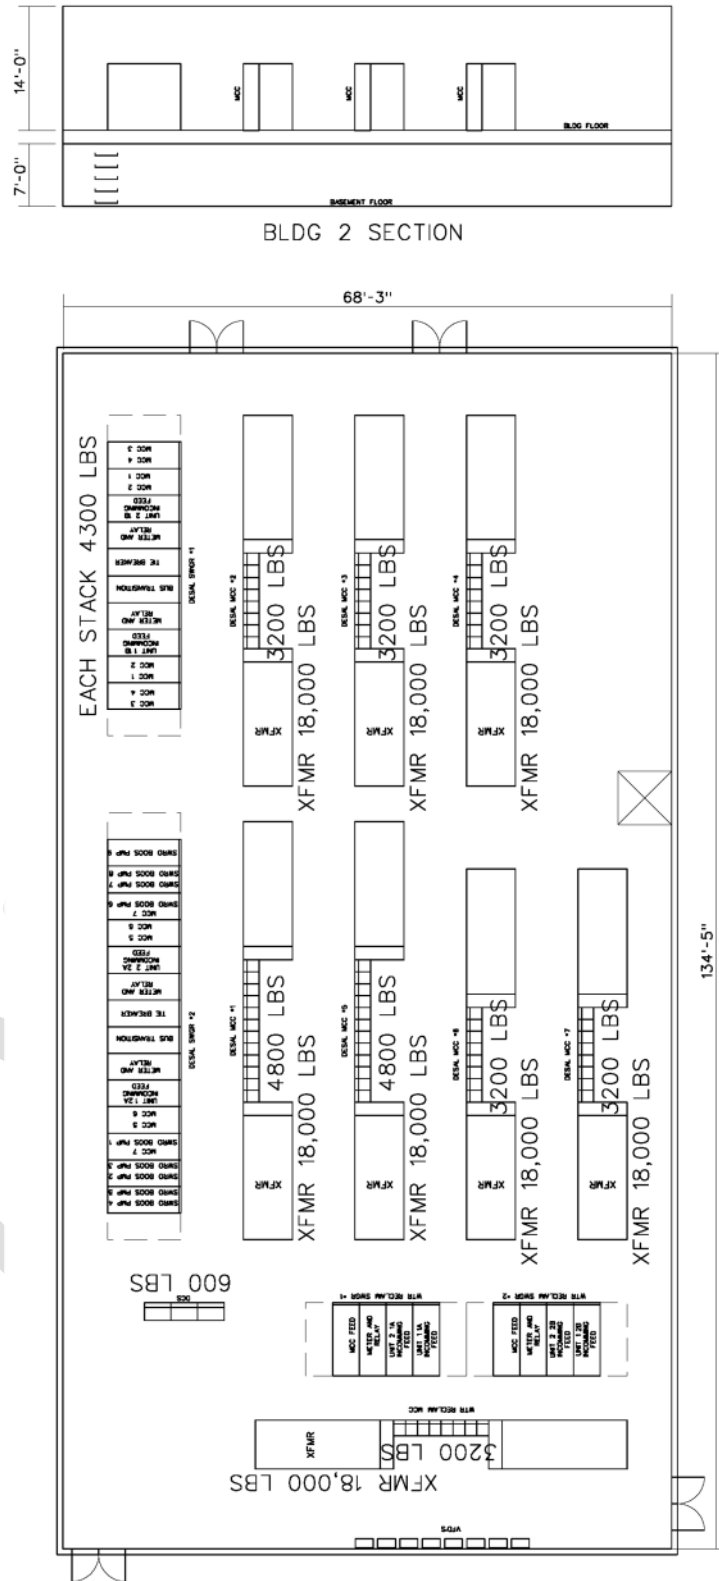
Hybrid Wet/Dry Cooling—Cooling Tower and Pumphouse Electrical Buildings
